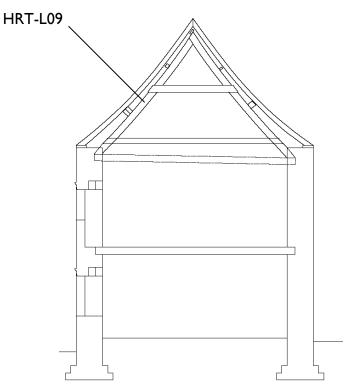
Truss 7 (west face), showing the location of sample HRT-L09 (Morton & Hall Consulting Ltd)
